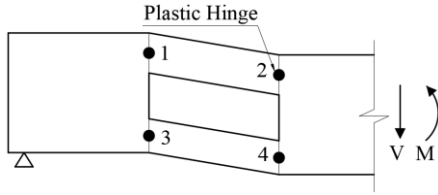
Collapse mechanism of beams with a large opening in the shear zone [32]
